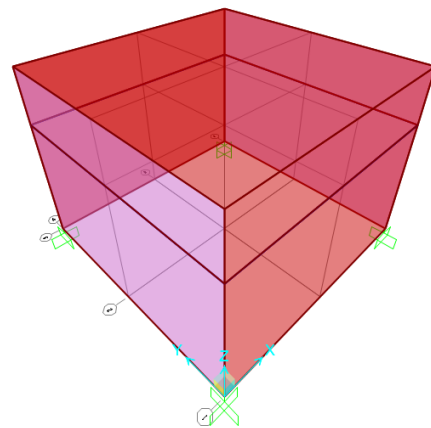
Single storey Lintel banded masonry house prepared in SAP-2000.
